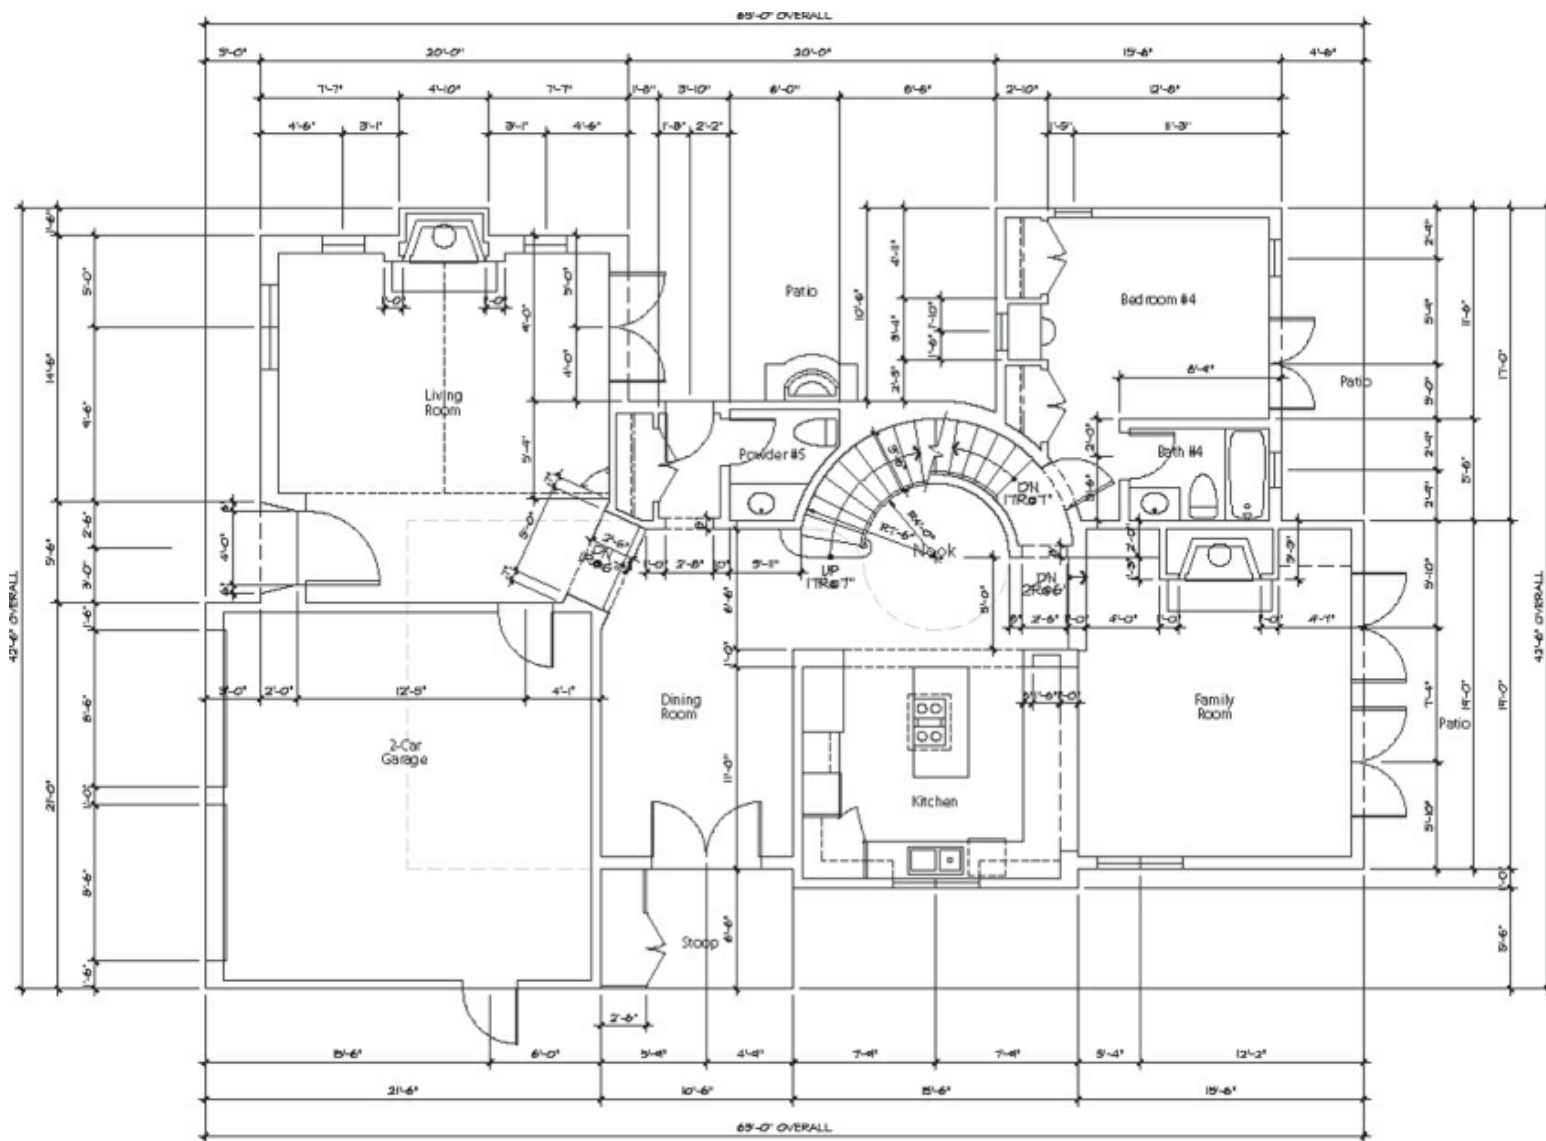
Stage II: Exterior/interior wall and openings.
